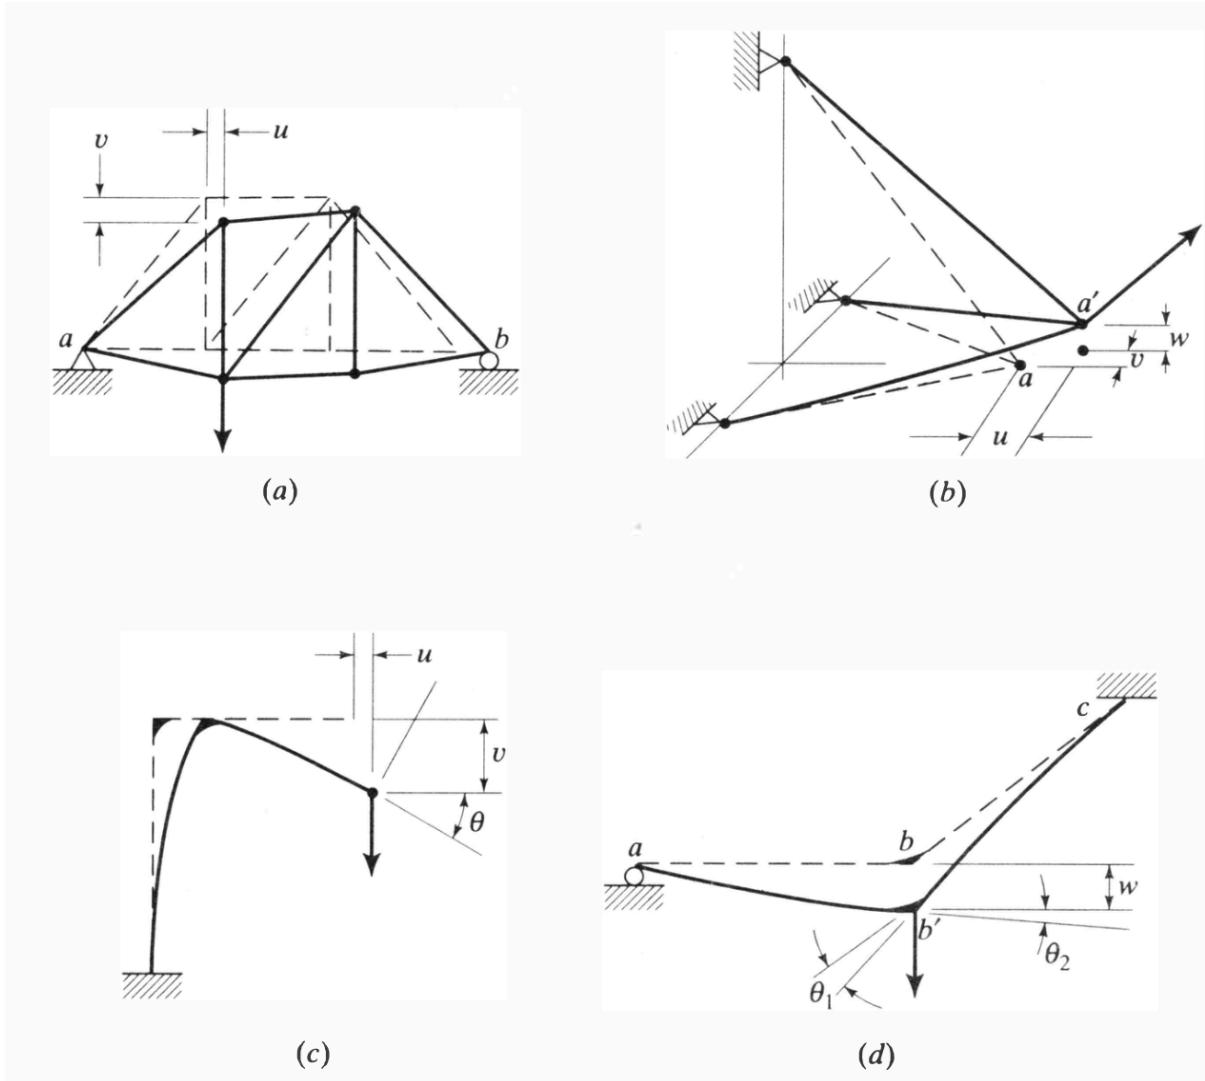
Joint displacements. (a) Pin-jointed plane truss. (b) Pin-jointed space truss. (c) Plane frame (in-plane loading). (d) Plane frame (out-of-plane loading).
